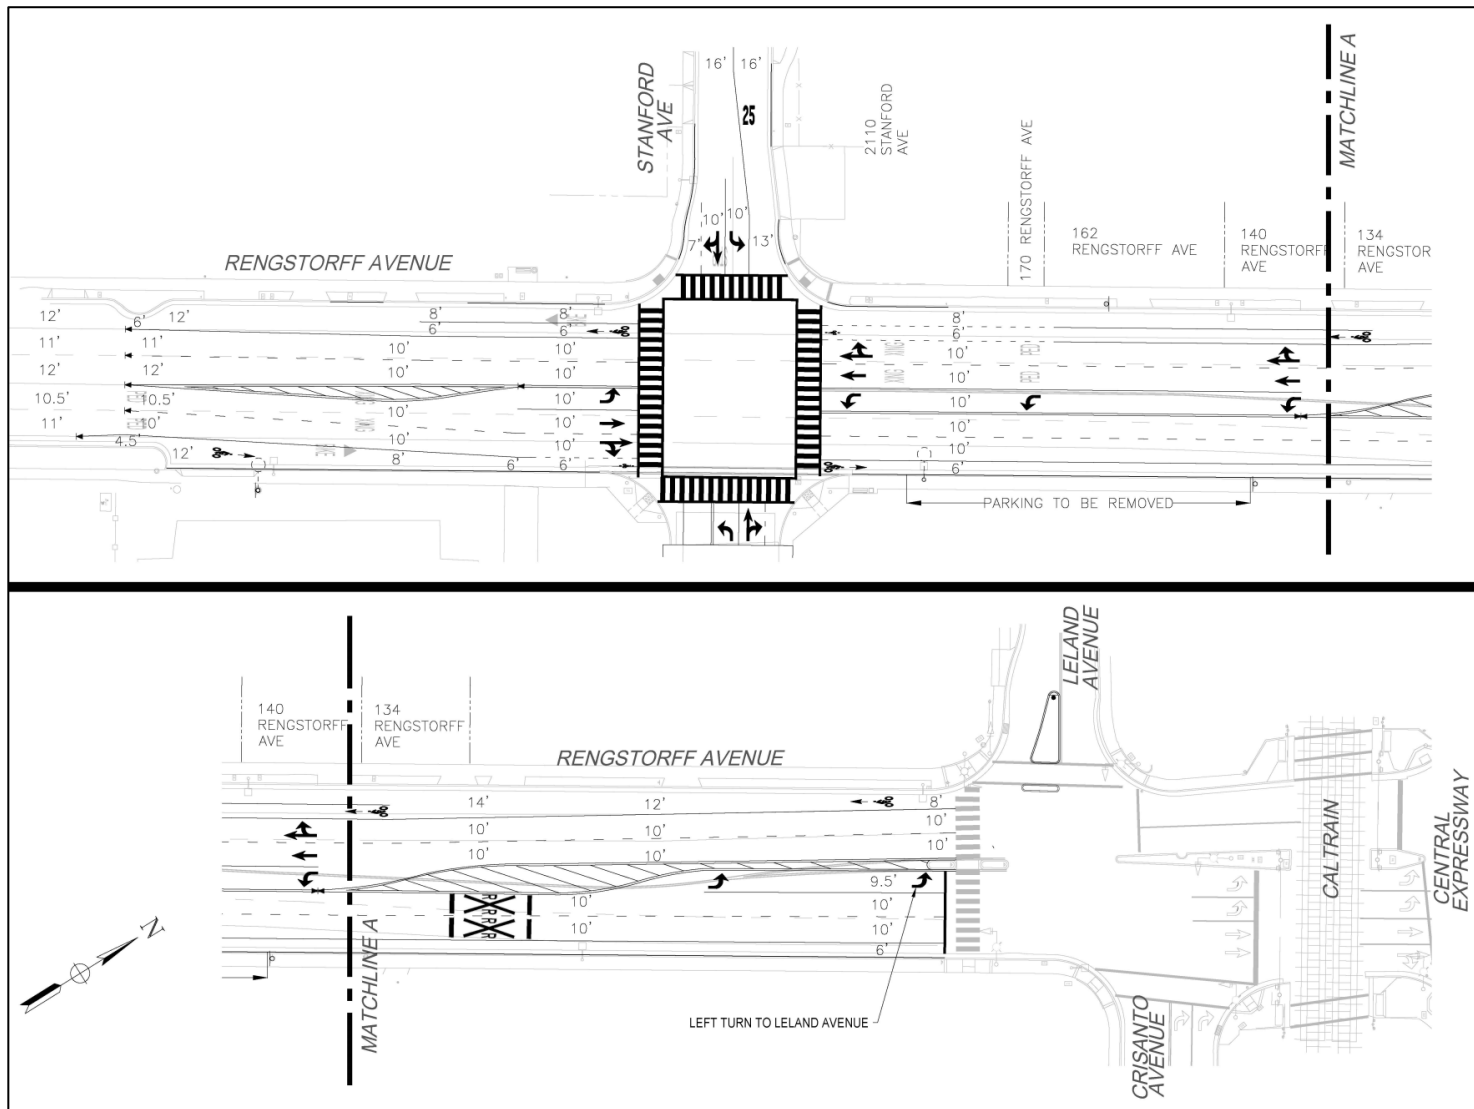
Exhibit D – New Traffic Signal and Driveway at Rengstorff and Stanford Avenues
